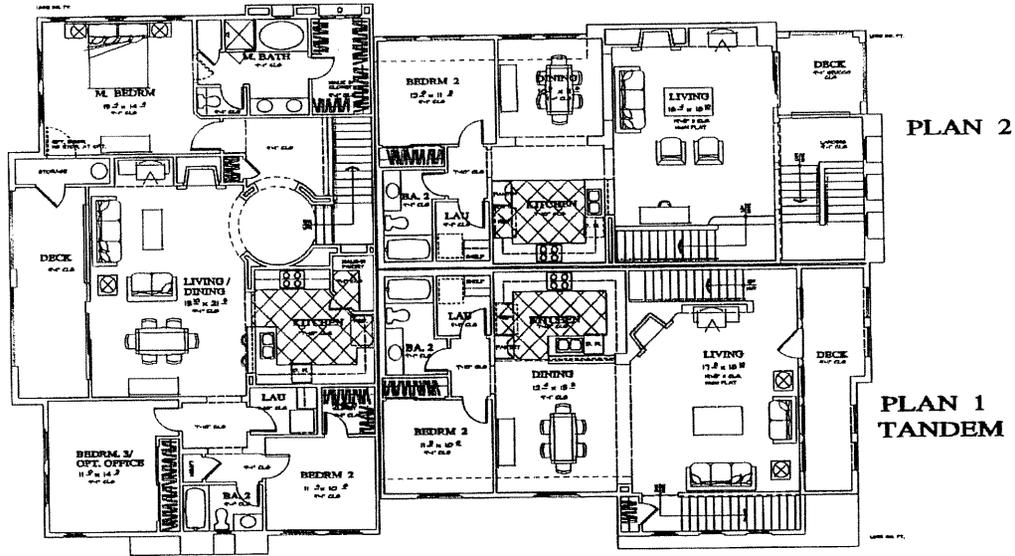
L - Arborelle - Building A - Floor Plans and Elevations (w/ Tandem Garage)
